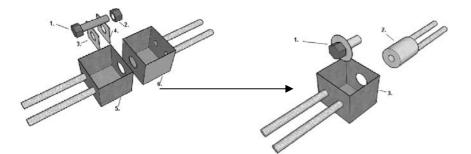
Connection device, floor-to-floor and wall-to-wall.
